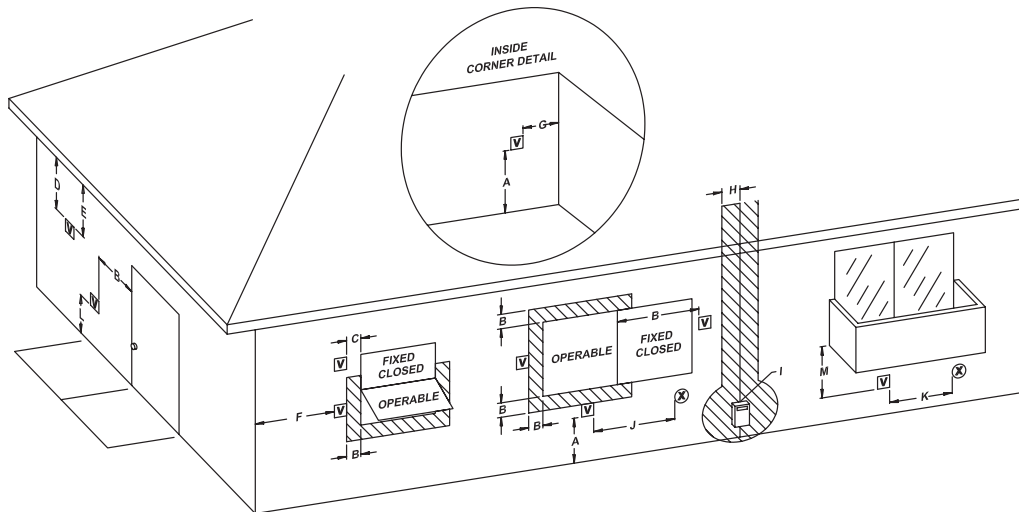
Minimum Clearances from Vent/Air Inlet Terminations – Indoor and Outdoor Installations
